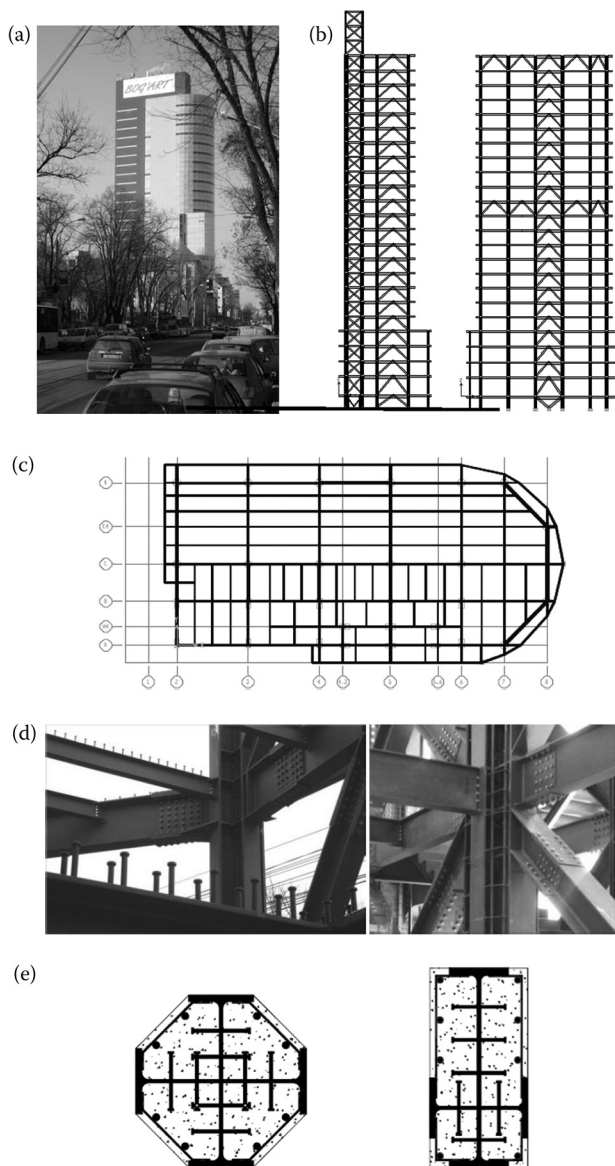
International Centre Tower, Bucharest: (a) view; (b) structural system; (c) current floor plan; (d) column sections; (e) view during erection of steel structure. (From Dubina, D. et al. 2006: Analysis and design considerations regarding the project of Bucharest Tower Centre steel structure. In *Proceedings of the International Conference in Metal Structures*, Poiana Brasov, Romania, 20–22 September, Steel—A New and Traditional Material for Building, (eds. Dubina, Ungureanu), Taylor & Francis Group, London, 601–608.)
